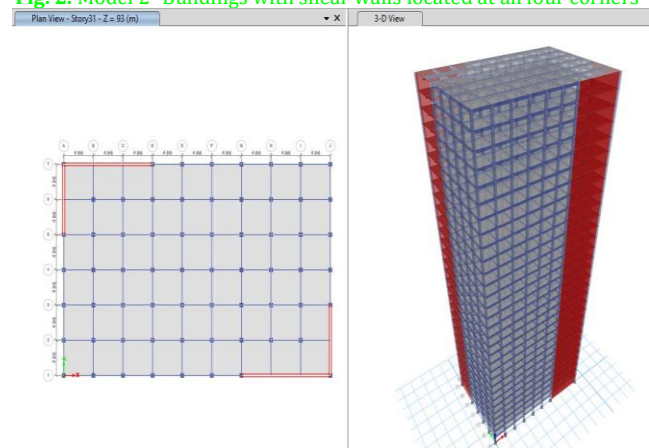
Model 4- Buildings with shear walls located at only two opposite corners
